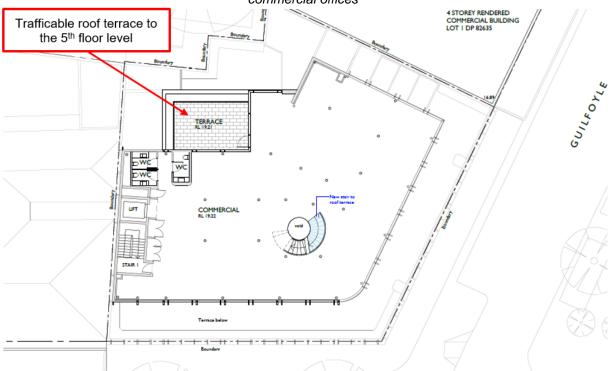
Floor plan of the 5th floor level showing the extent and location of the trafficable terrace to the commercial offices
